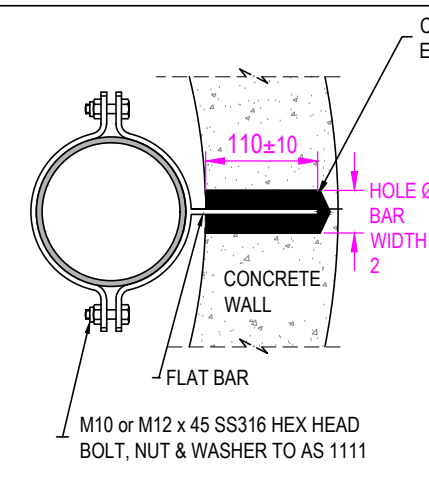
H: INTERNAL DROP PIPE SUPPORT BRACKET FOR DROP PIPES ≤DN225
